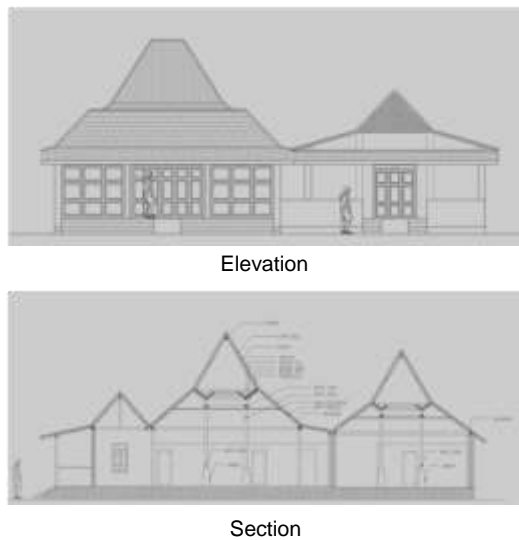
Section and Elevation Of Omah Dudur Loro Komplit (Source: Author, 2016)
